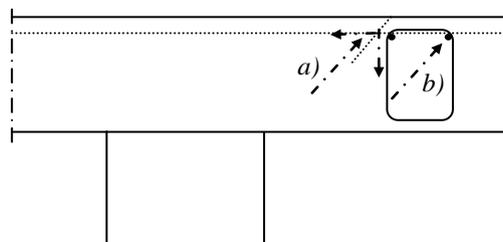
Forces acting in a slab supported on columns, a) the inclined compressive forces cannot be taken by the stirrups, b) the inclined compressive forces can effectively taken by the stirrup. The figure is based on Westerberg (1995).
